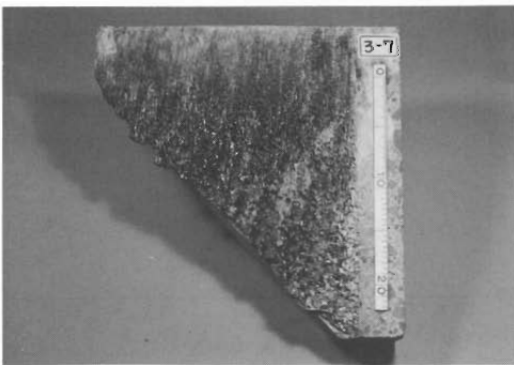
Cut Surface of Plain Concrete Specimen (Maximum Thickness of 30 cm)
